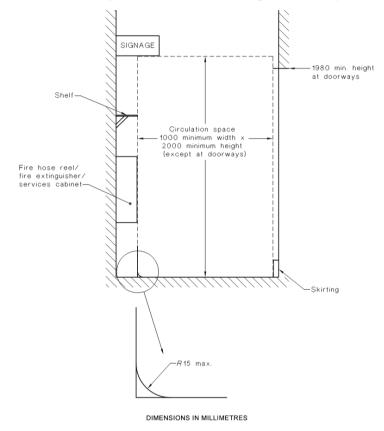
CONTINUOUS ACCESSIBLE PATH OF TRAVEL—MINIMUM HEIGHT AND WIDTH
